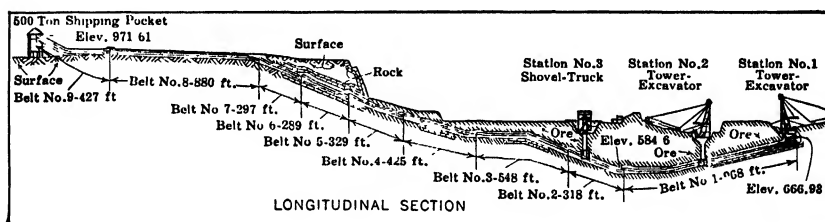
Belt Conveyor System 4400 Feet Long for Iron Ore, Open-pit Mining.
